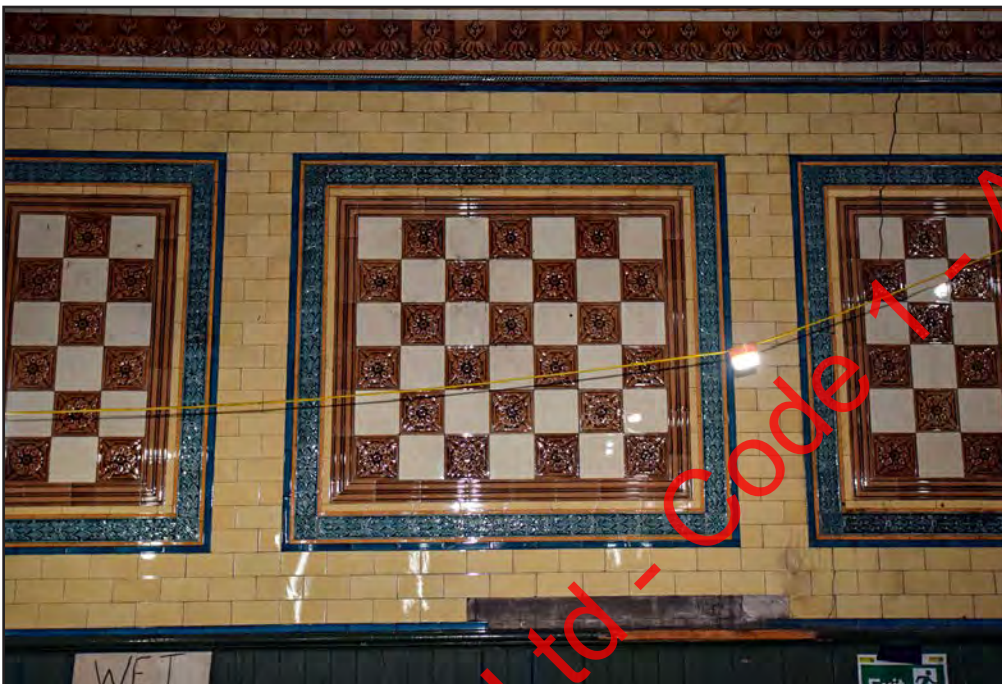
Glazed tiles to east wall (former corridor) after cleaning
